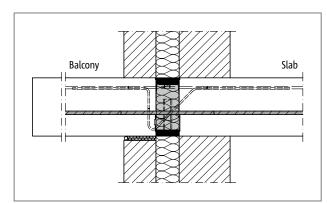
Schöck Isokorb® T type K, H-NN: Connection with non- cavity masonry
